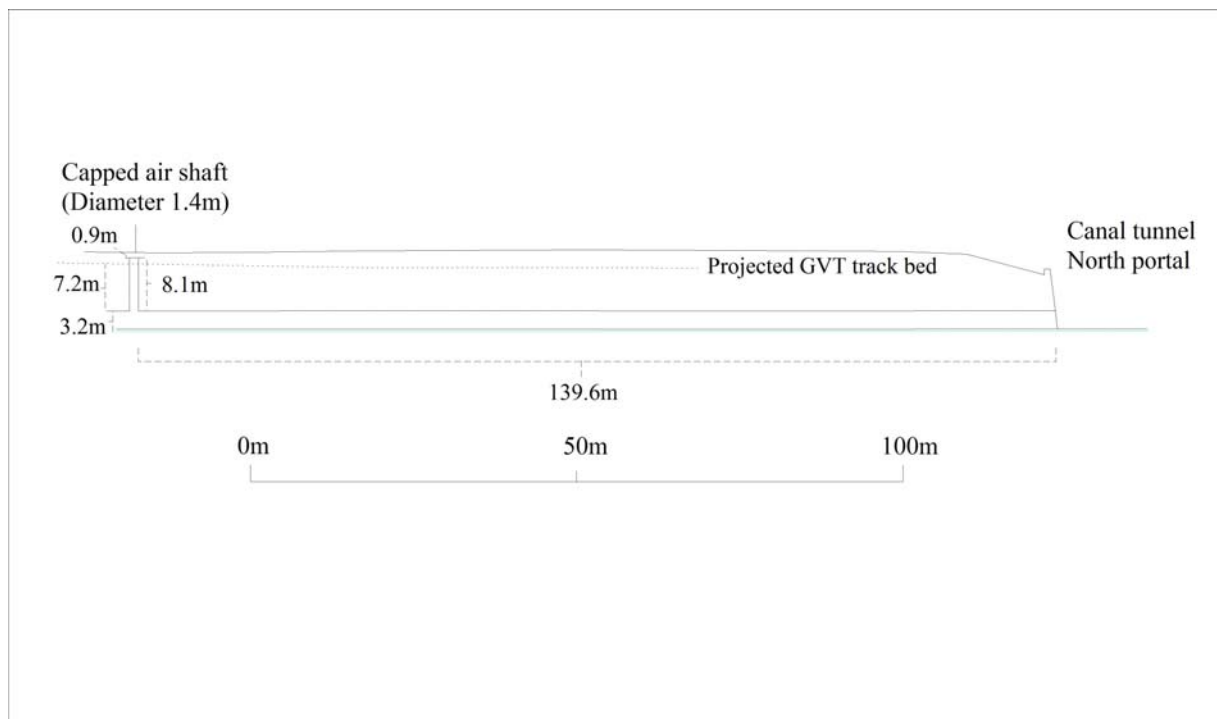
Section showing the canal tunnel, overlying topography, and tramway track bed
